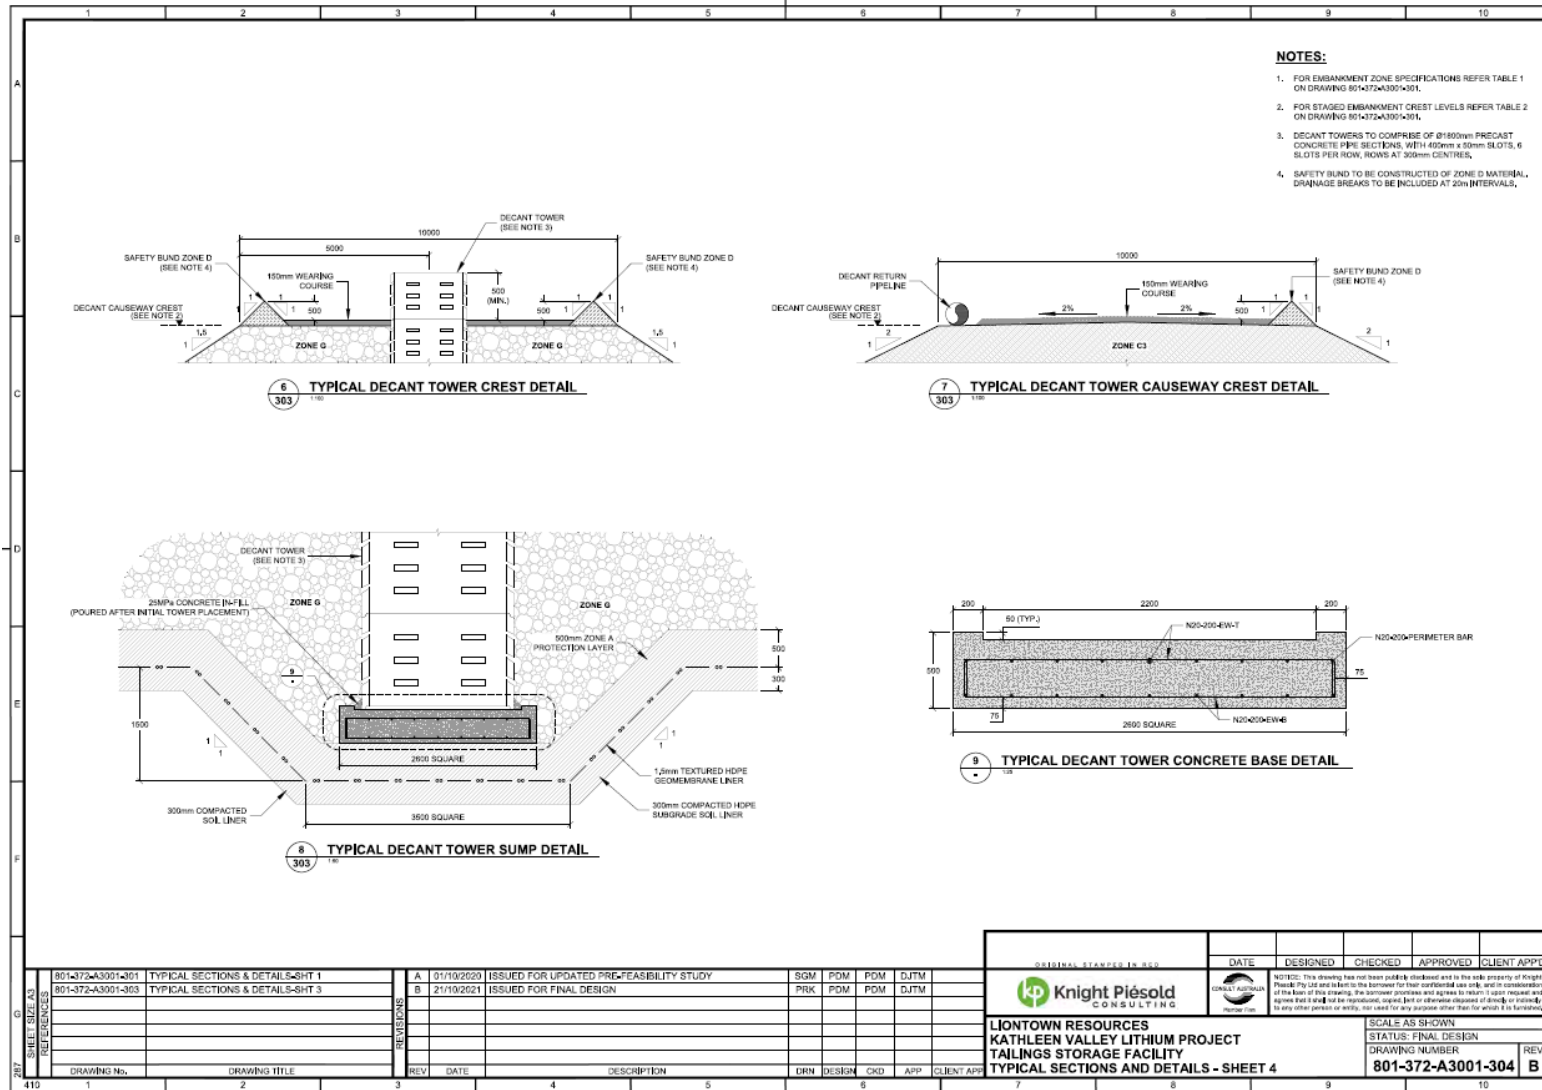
Tailings Storage Facility Section Detail, Decant Tower – 801-372-A3001-304
